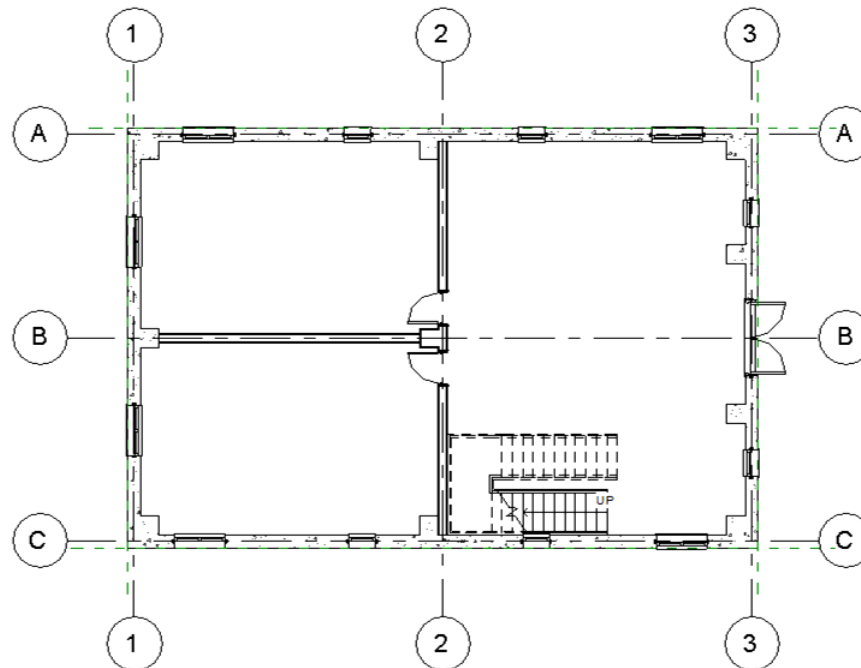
Typical floor plan: Ground Floor (Revit 2013)
